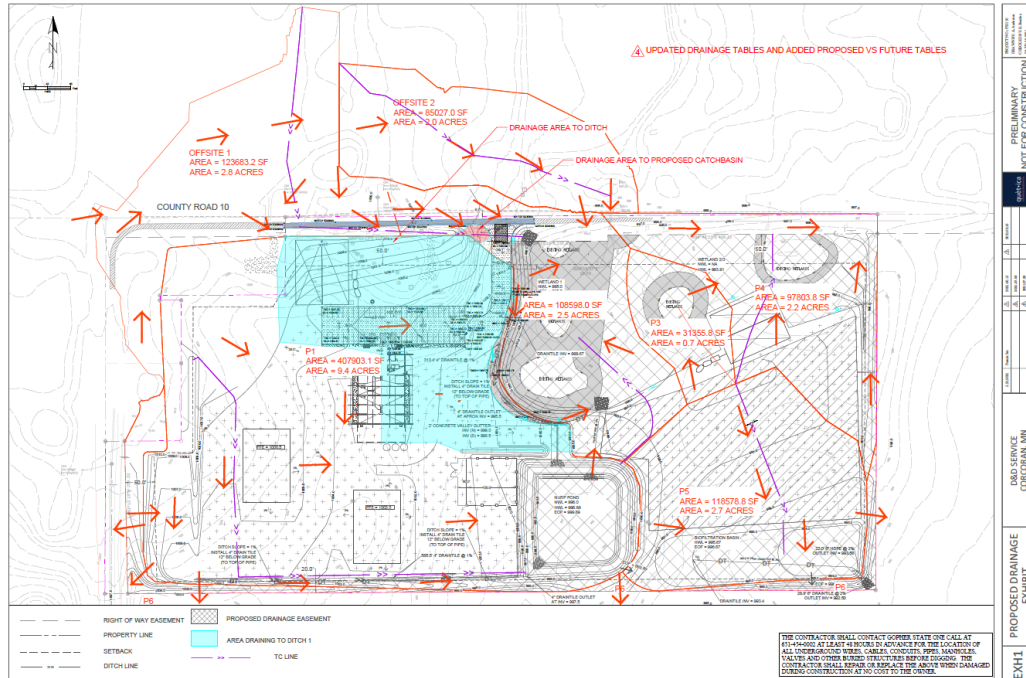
Project Proposed Drainage (Drawings will be updated by applicant)
